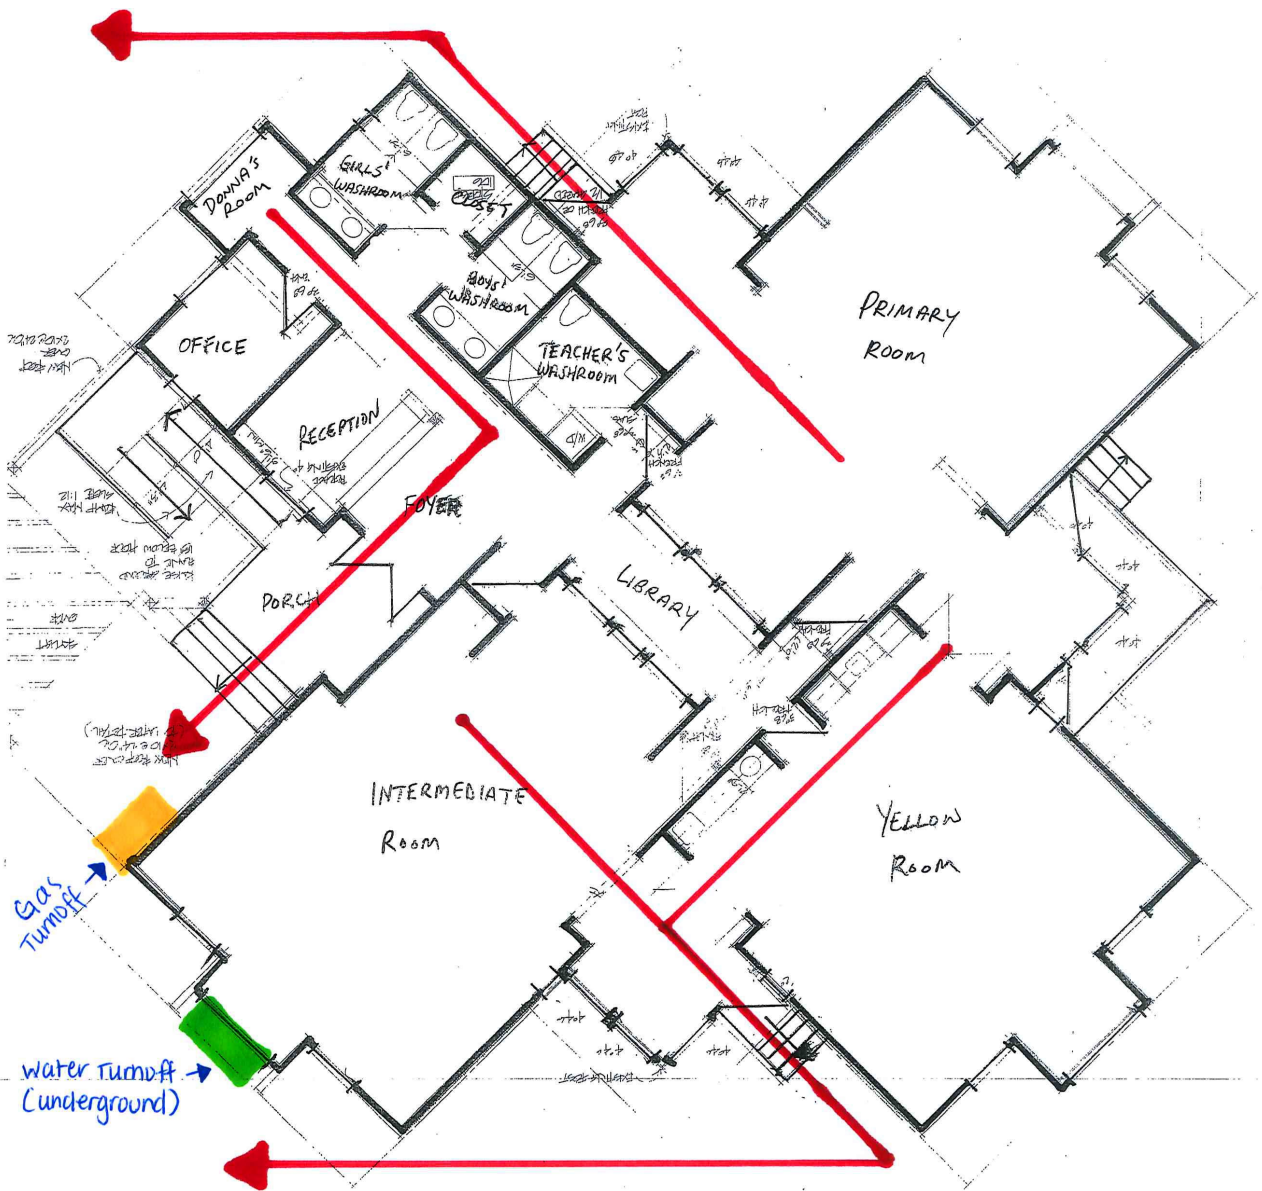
Floor plan of Boundary Bay Montessori School Building # 3
